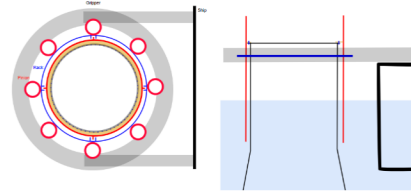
Principle of the gripper-sleeve connection. In this example driven by a geared driving mechanism. For explanatory reasons the dimensions are not to scale.
